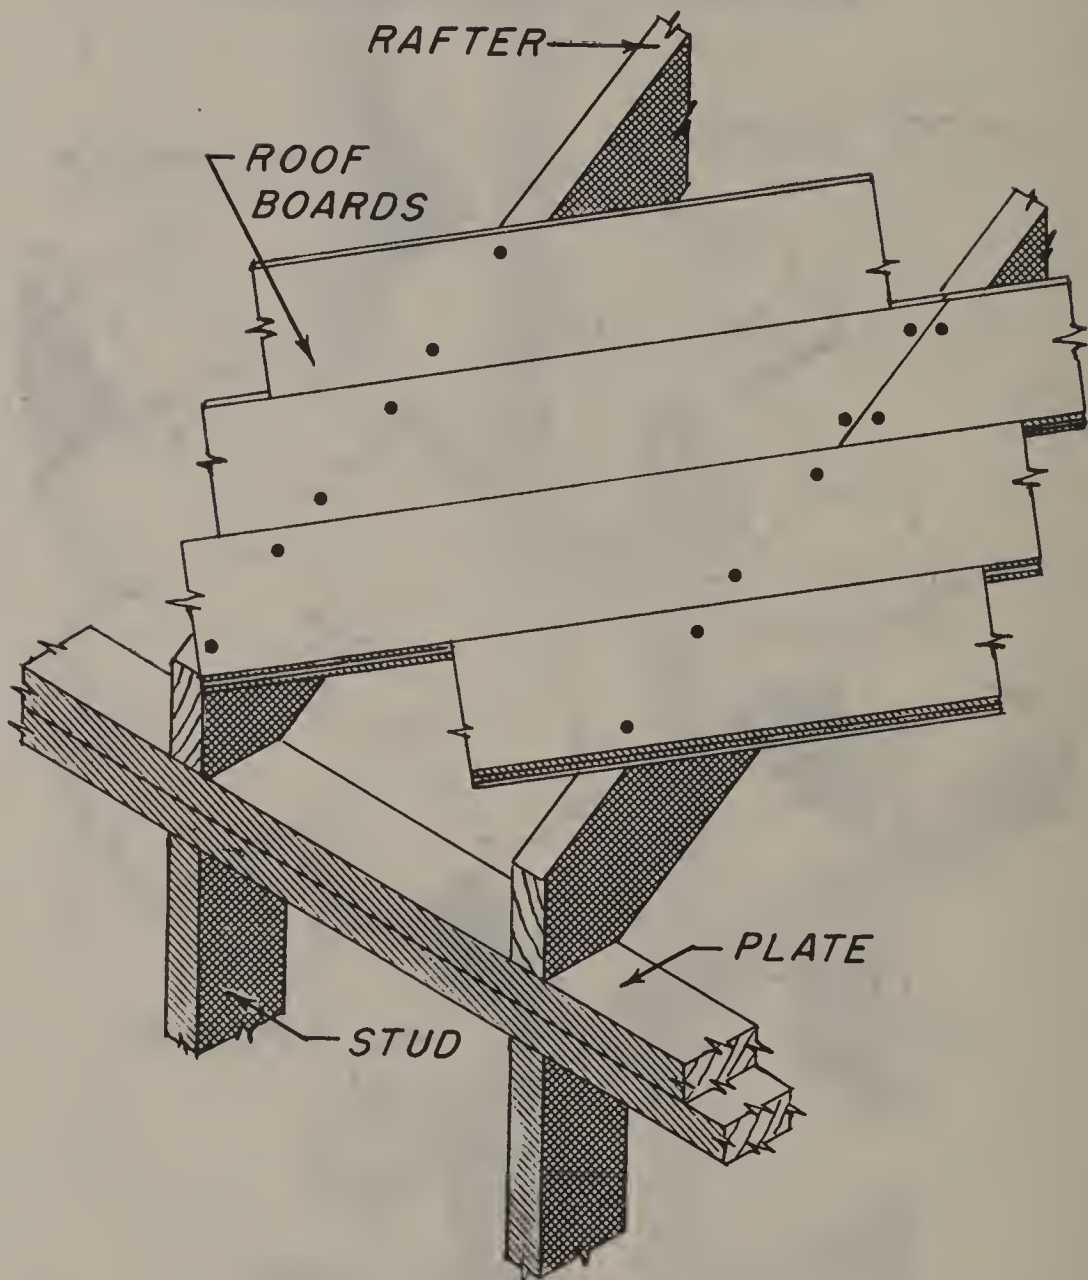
Diagonal roof sheathing. Boards 6 inches and less in width nailed to rafters with two eightpenny nails. Wider boards nailed with three eightpenny nails. Diagonal sheathing should be similarly nailed to a 2-inch ridge and to headers cut in between and securely nailed to rafters at or near the plate. Note: Diagonal roof sheathing, although seldom used, adds rigidity to any roof. When well nailed it transfers much of the rafter thrust to the end rafters and reduces the tendency of the rafter plates to bow outward and cause sag of rafters. Plywood sheathing functions similarly.
